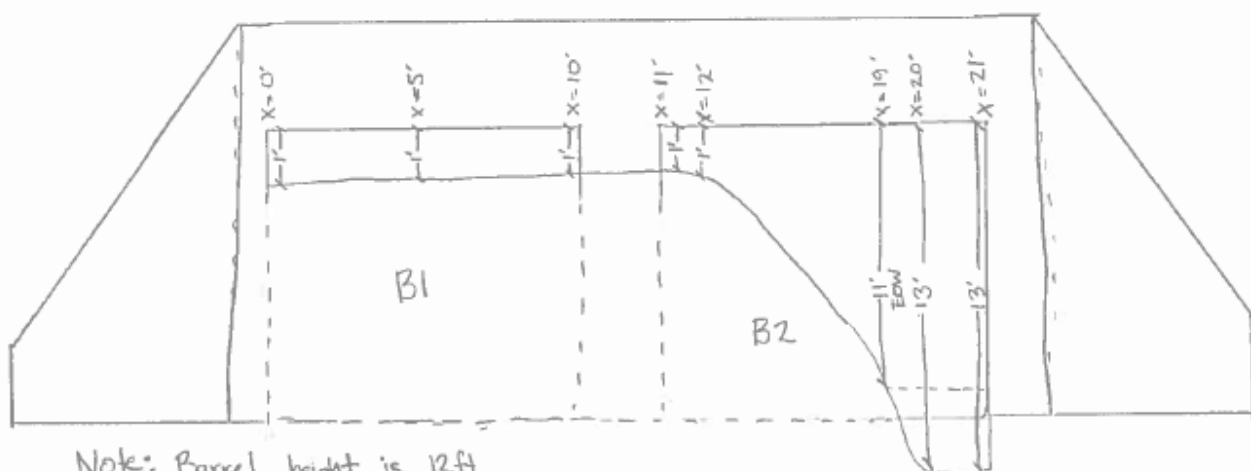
Example of a Stream Cross Sections at Bridge Fascias
